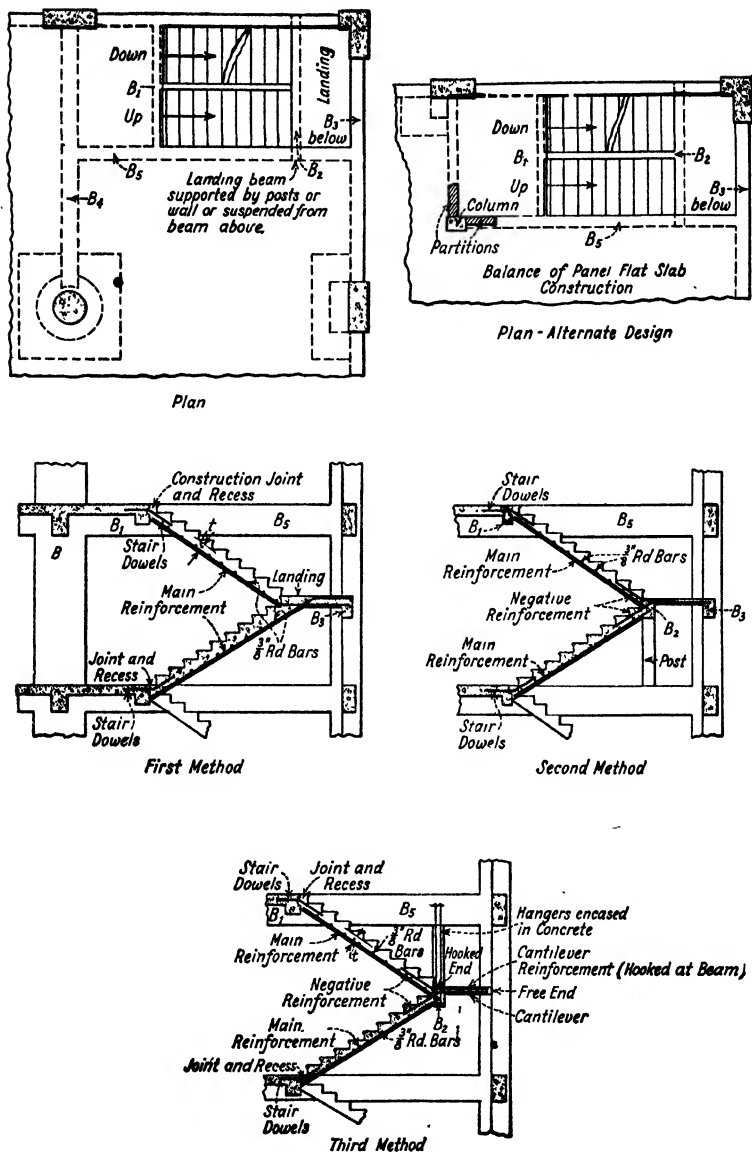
Structural Details of Stairs. (See p. 690.)
